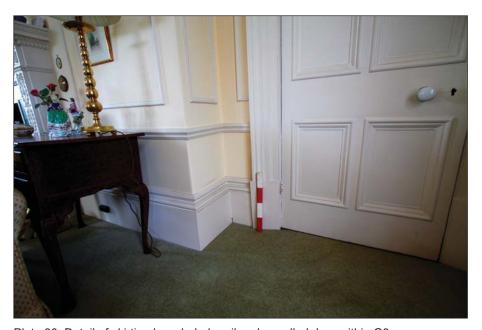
Detail of skirting board, dado rail and panelled door within G3
